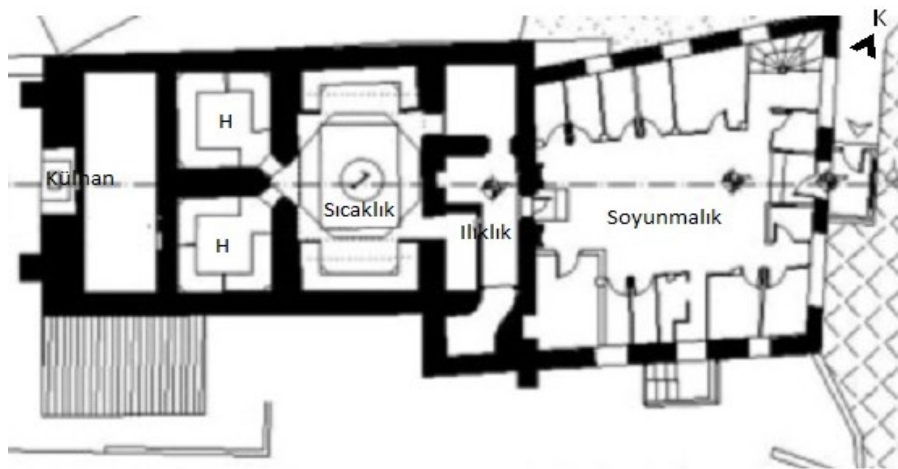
Mezitbey Bath's Plan (Aşut, 2012).
